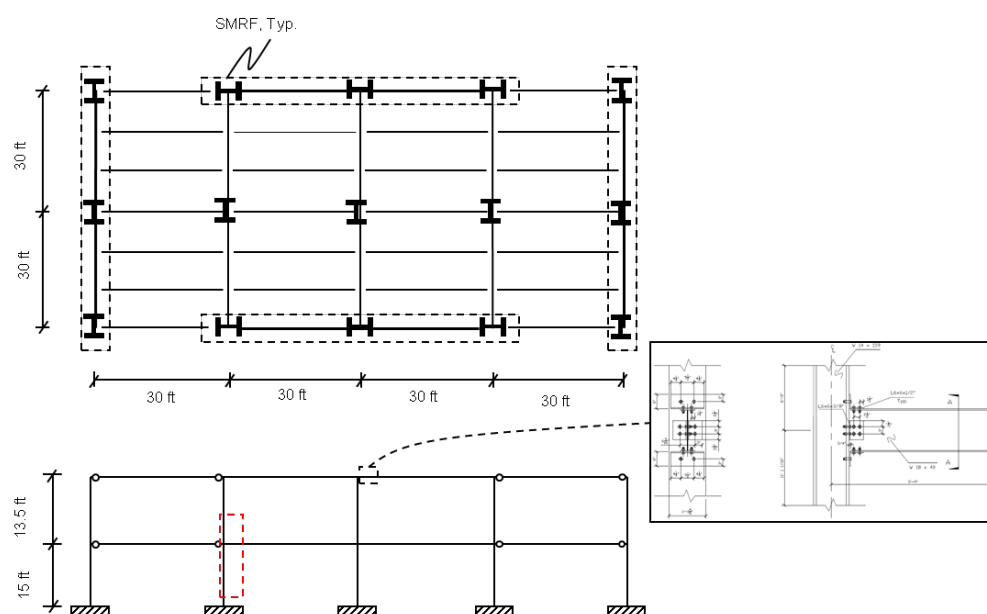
Plan view of the structure, an elevation of the SMRF and a zoom-in of a typical connection topology
